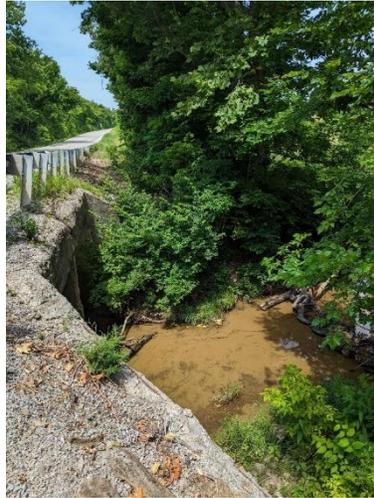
Culvert with exposed bedrock near mile marker 14 on KY-32.
